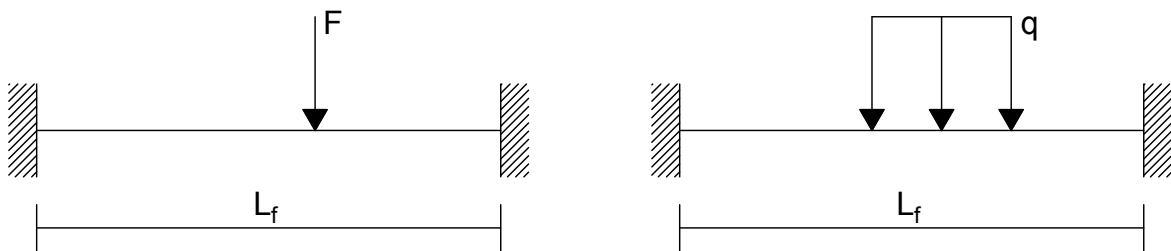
General floor model for the calculation of point loads and distributed loads
